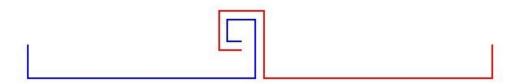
21 16 – 1: Cross Section Wall Panels J-Type Interlocking
